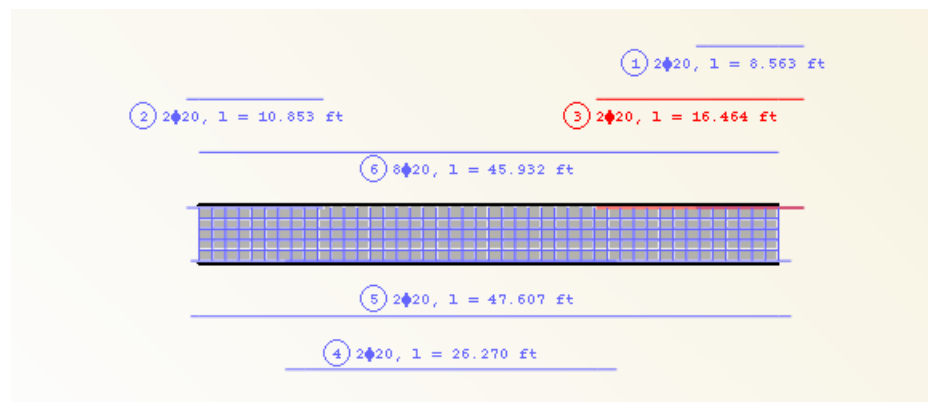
Reinforcement drawing in table 3.1 *Longitudinal Reinforcement Provided
